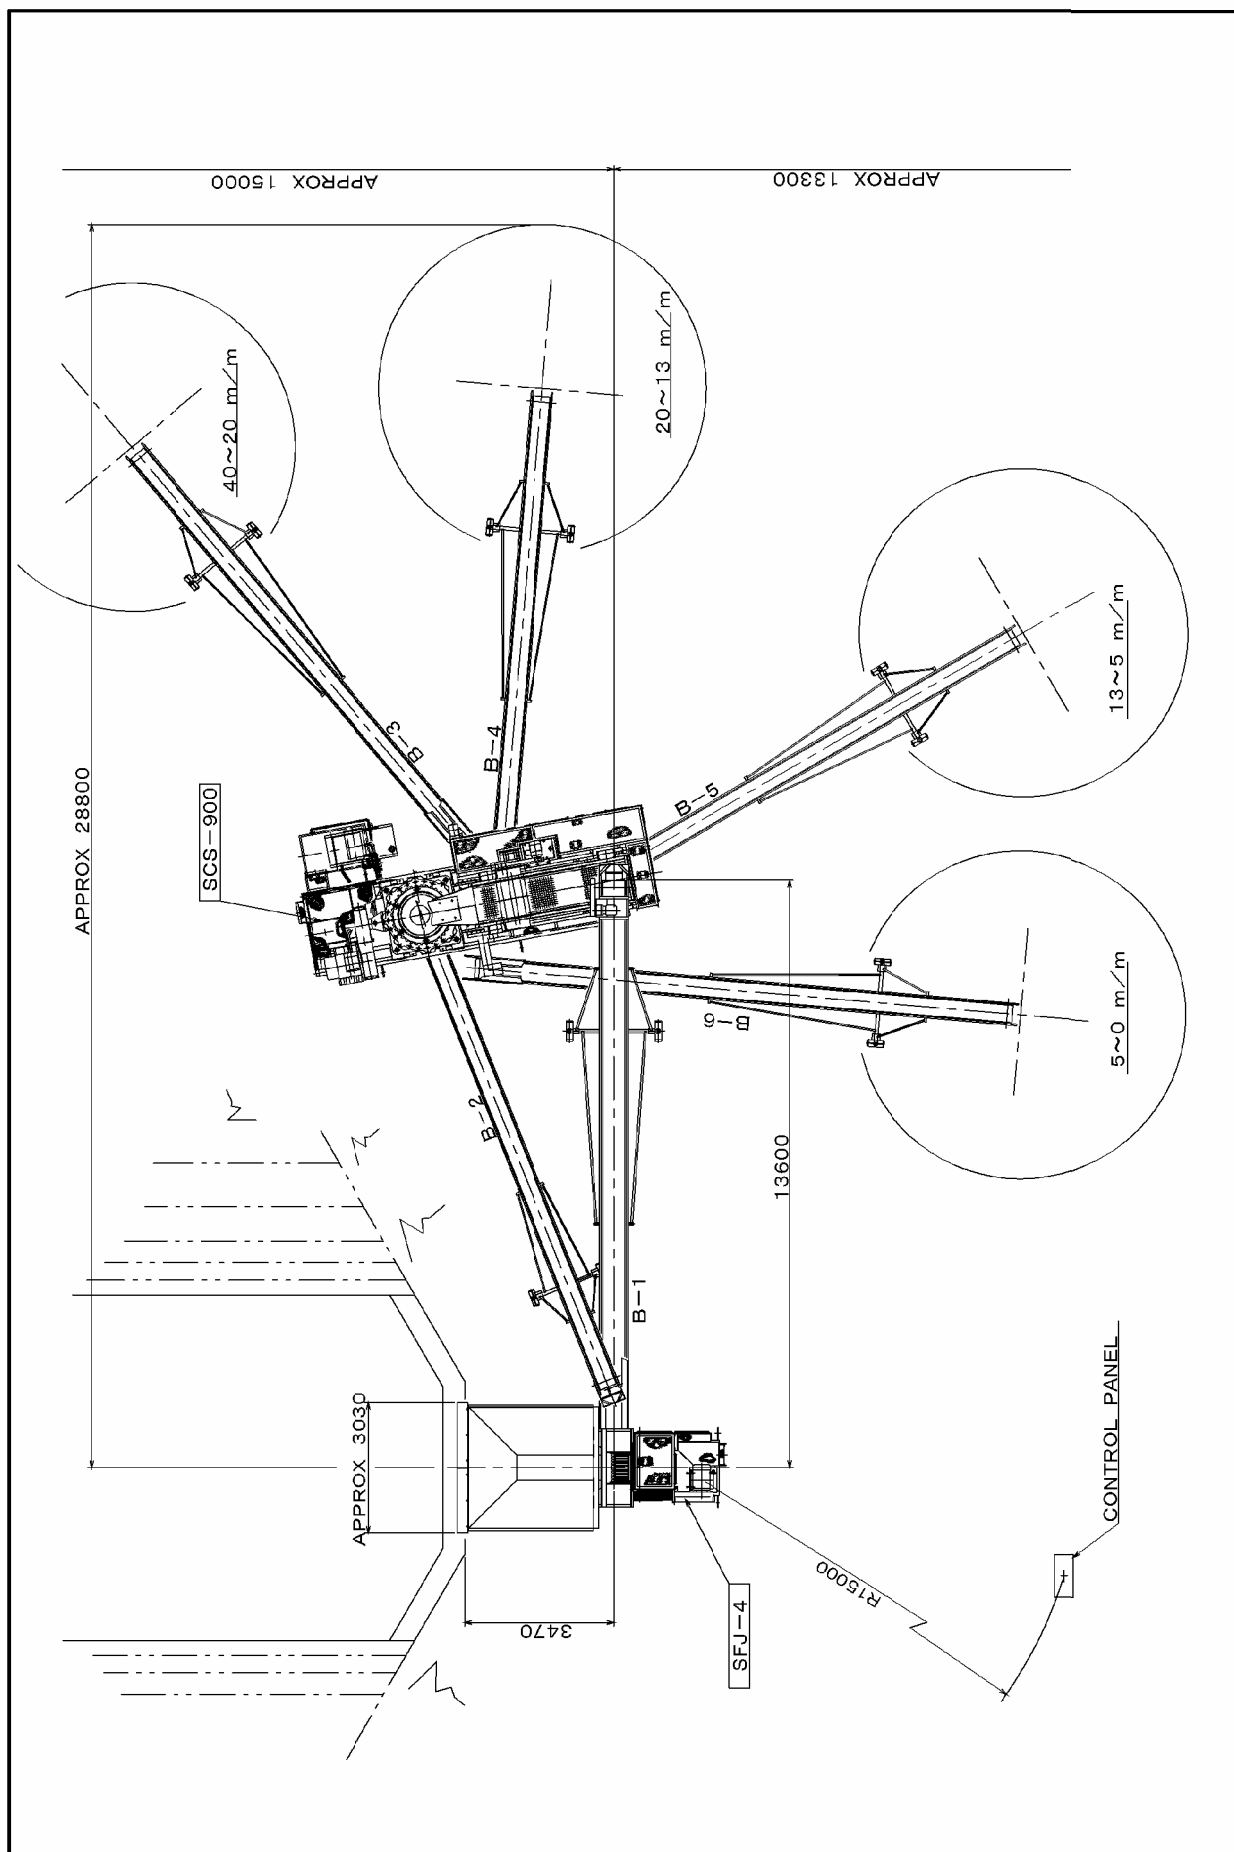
Layout Plan of Aggregate Plant
